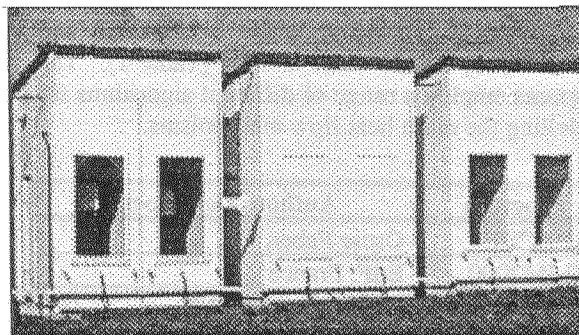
External view of the test rooms (rooms 0 to 5 lie from left to right).
